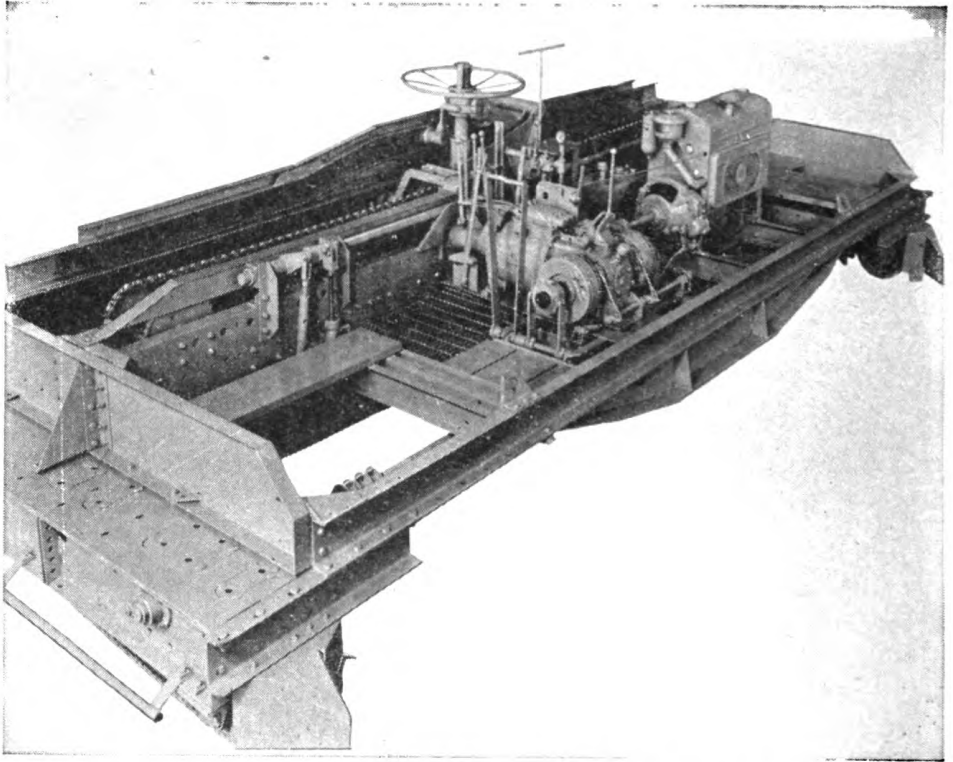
Spreader, concrete, gasoline-engine-driven, 20-foot width.
